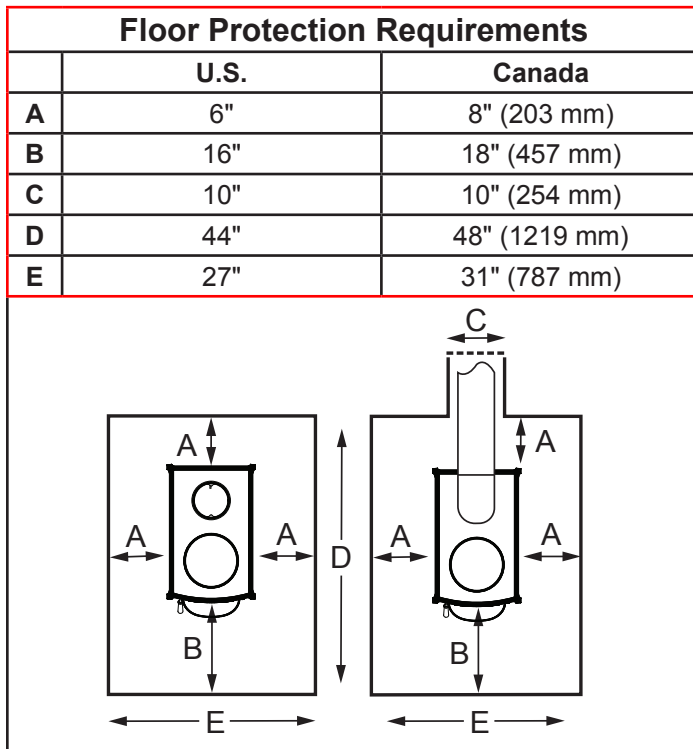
These dimensions are minimum requirements only. Use greater dimensions whenever possible.
